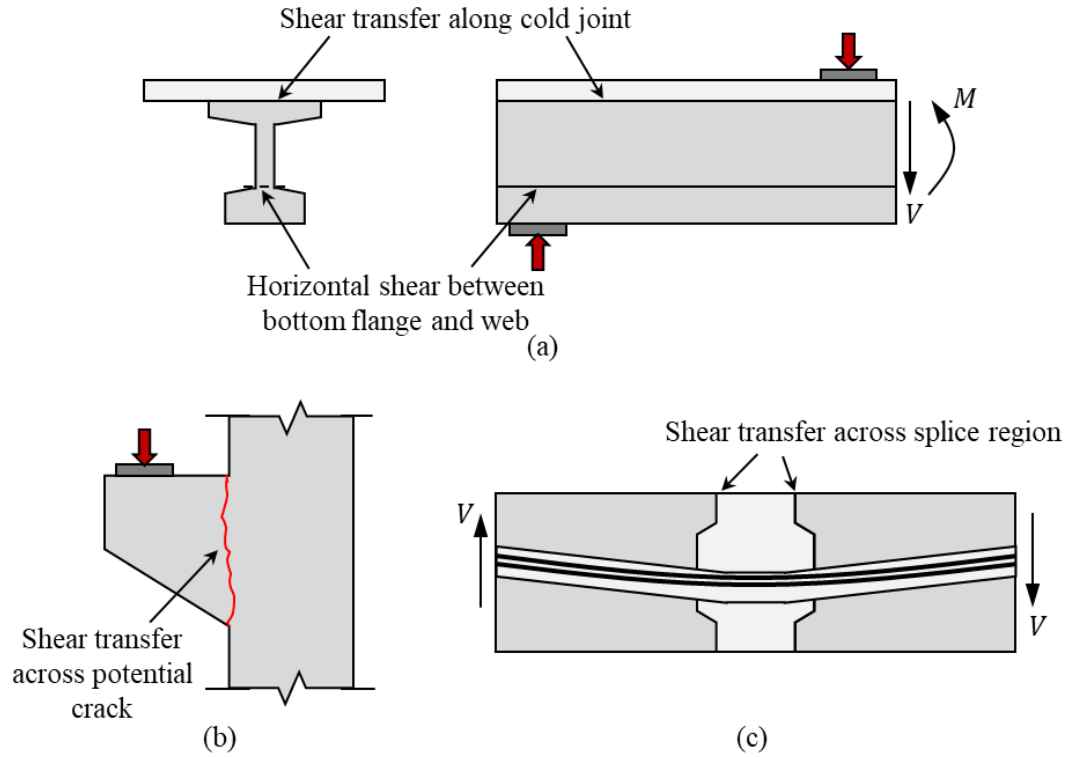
Examples of shear friction in (a) composite girder, (b) corbel, and (c) splice region (or other joint between precast members)
